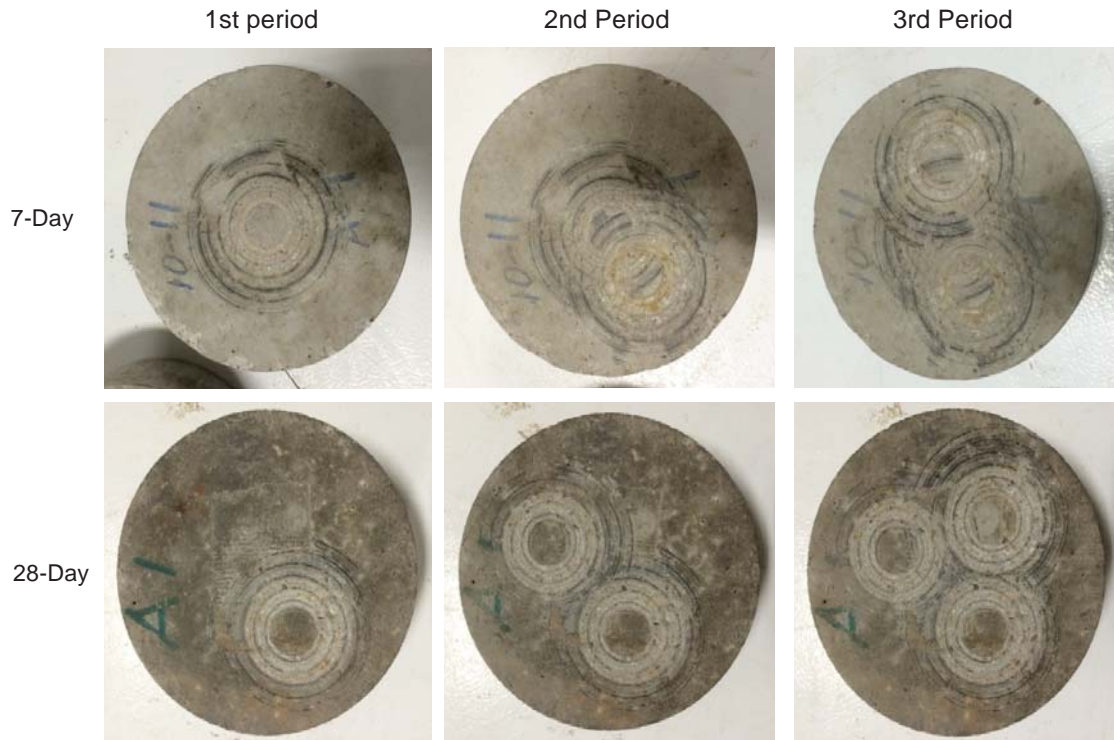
Abraded surfaces of the Class AAAP concrete specimens
